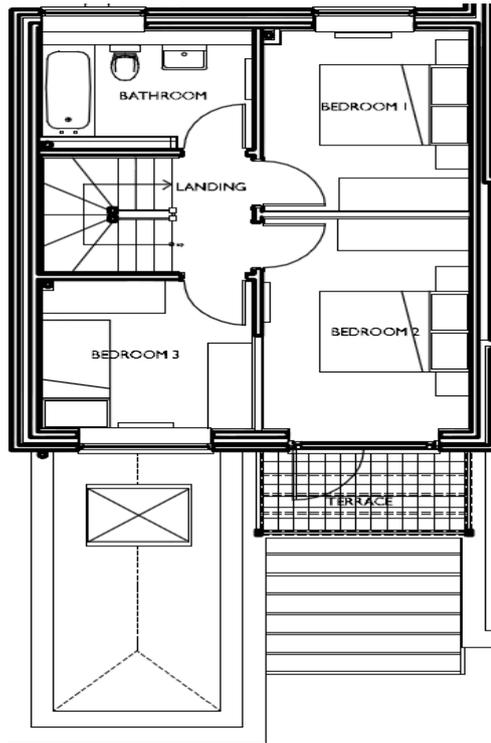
Phase 2 - 1st Floor Layout (Source: Marsh Grochowski, 2010)
